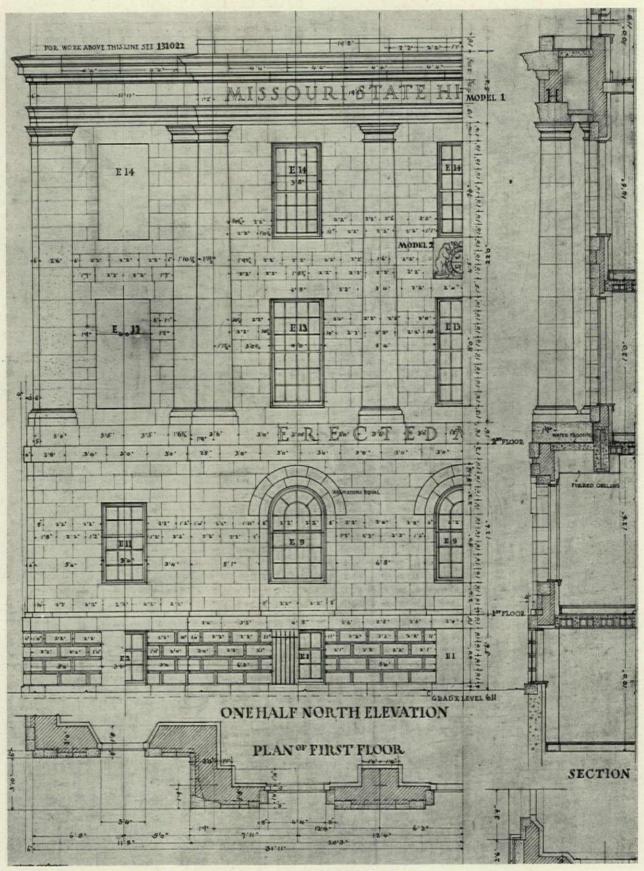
PORTION OF 1/4 INCH SCALE DRAWING FOR MISSOURI STATE HIGHWAY BUILDING EGERTON SWARTWOUT, ARCHITECT
